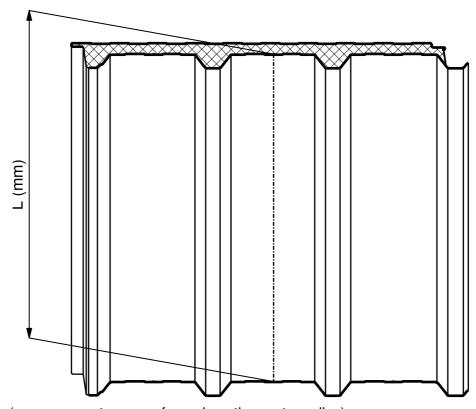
Length (measurement on a roof panel, on the center valley)
